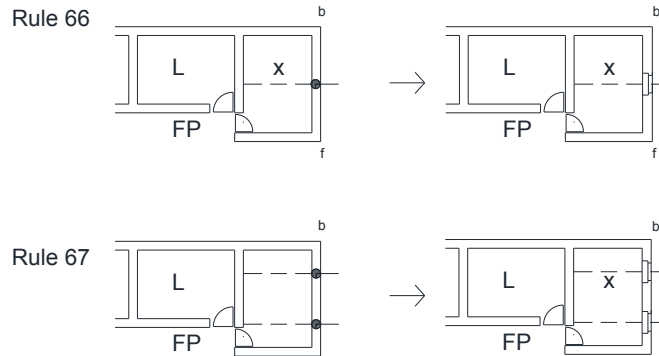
Rule for definition of windows on lateral wall of the house.
